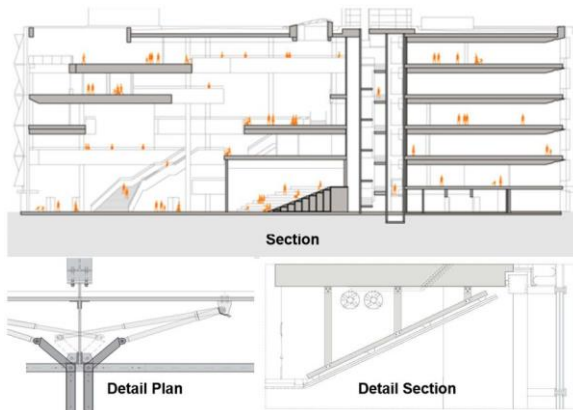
Kolding Campus building by Henning Larsen: Section, detail section and detail plan for building interna spaces and façade
